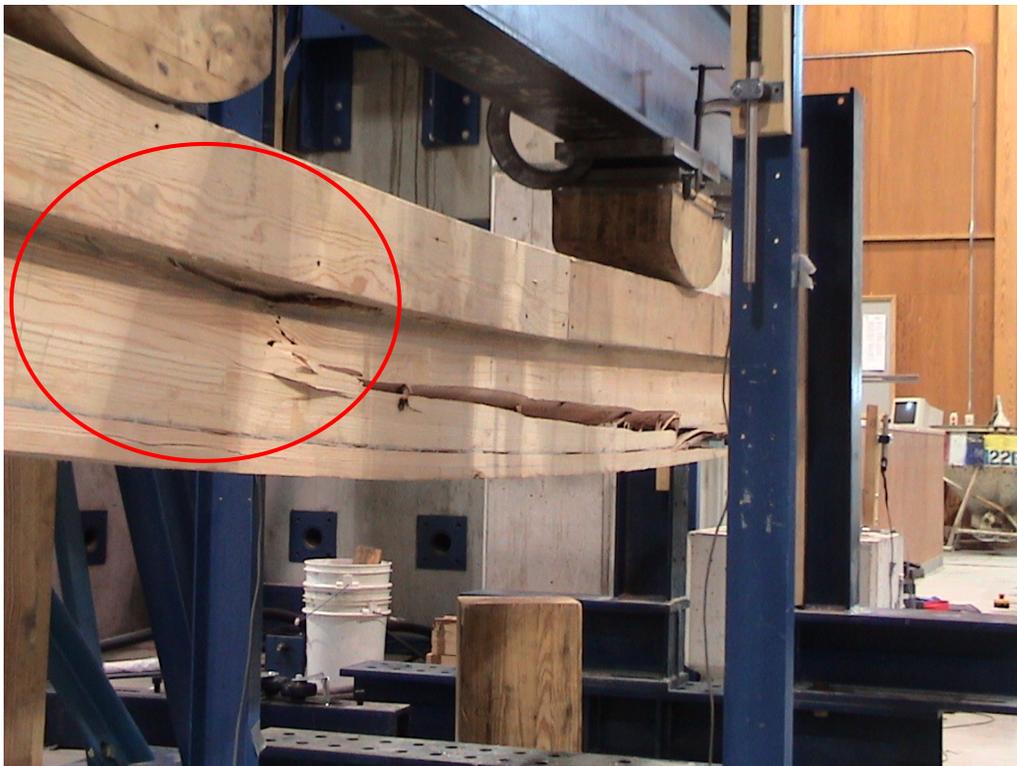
R-5 Failure: Possibly starts as horizontal shear failure under the left load head
